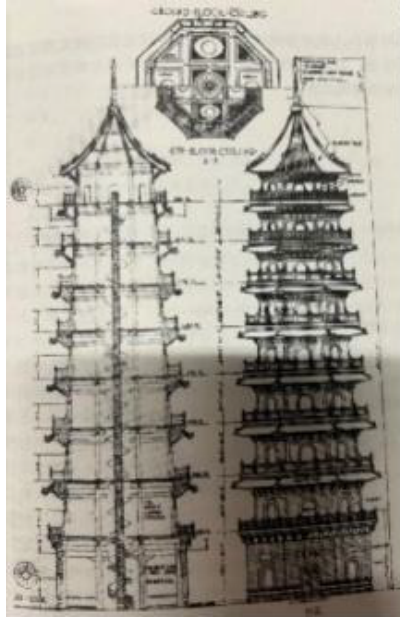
Section, elevation, and ground floor ceiling plan of the Pagoda-Tower at Lingusi. Designed by Henry Murphy and Doon Dayu.
